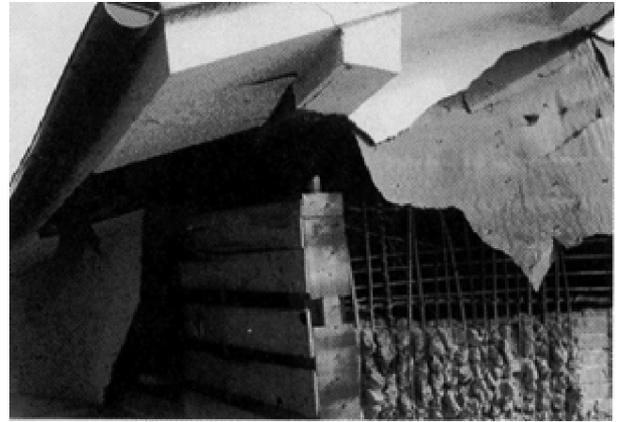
Connection failure of a wooden house in the Great Hanshin Earthquake in 1995 [8].
